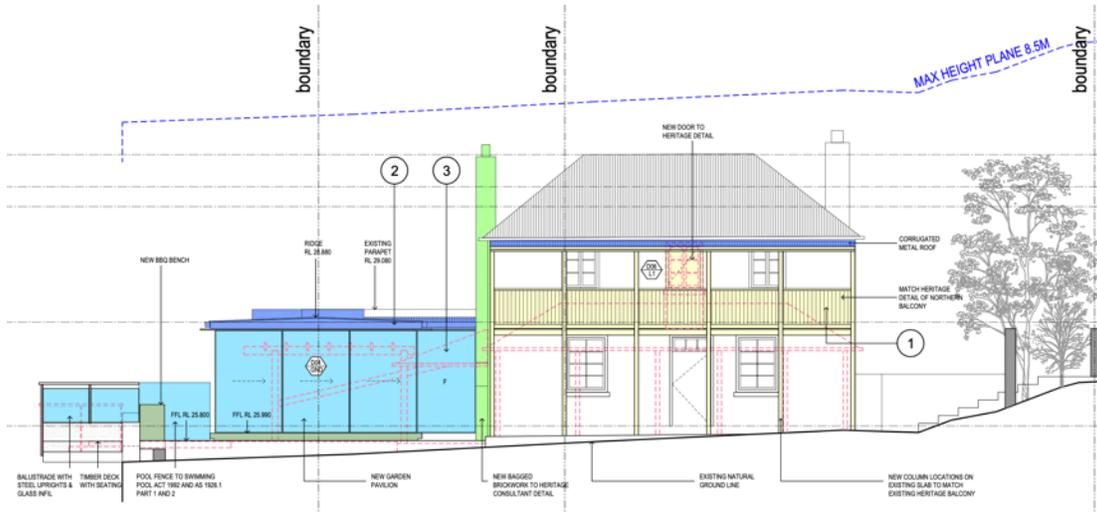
, Proposed South Elevation, *Michael Cumming Architect*, 24.02.23
